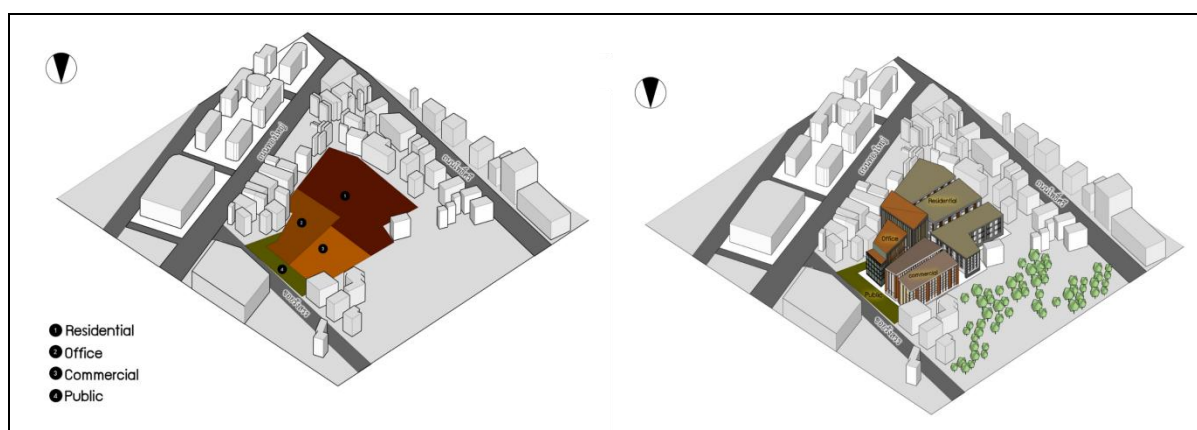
Land Use Plan and Allocation (Area 1)
